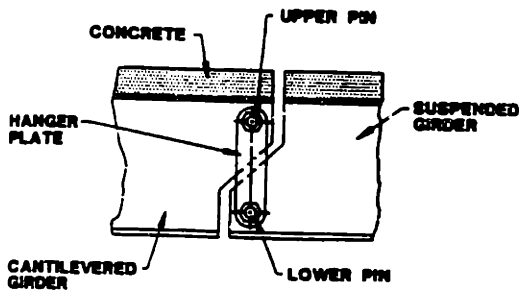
Cantilevered and suspended girder hanger plate and pin assembly.
